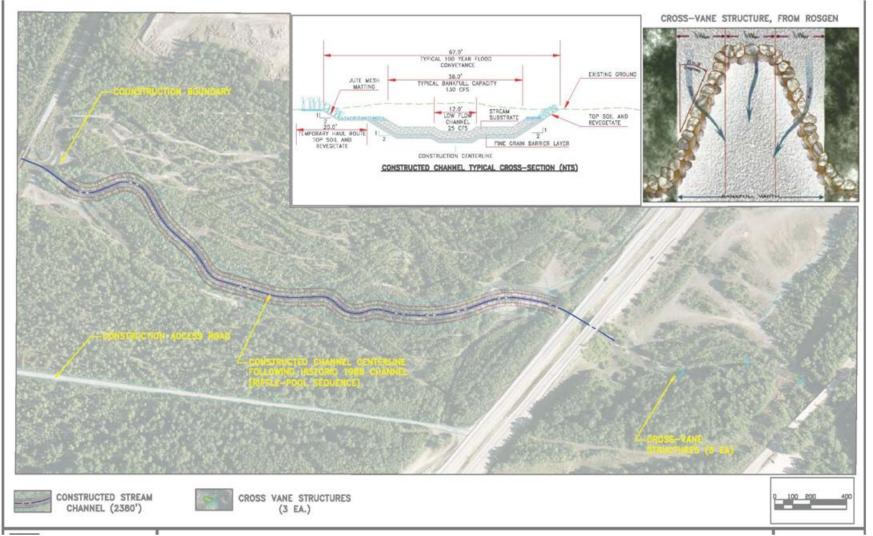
Alternative 3 – Constructed Channel with Upstream Cross-Vane Weirs
